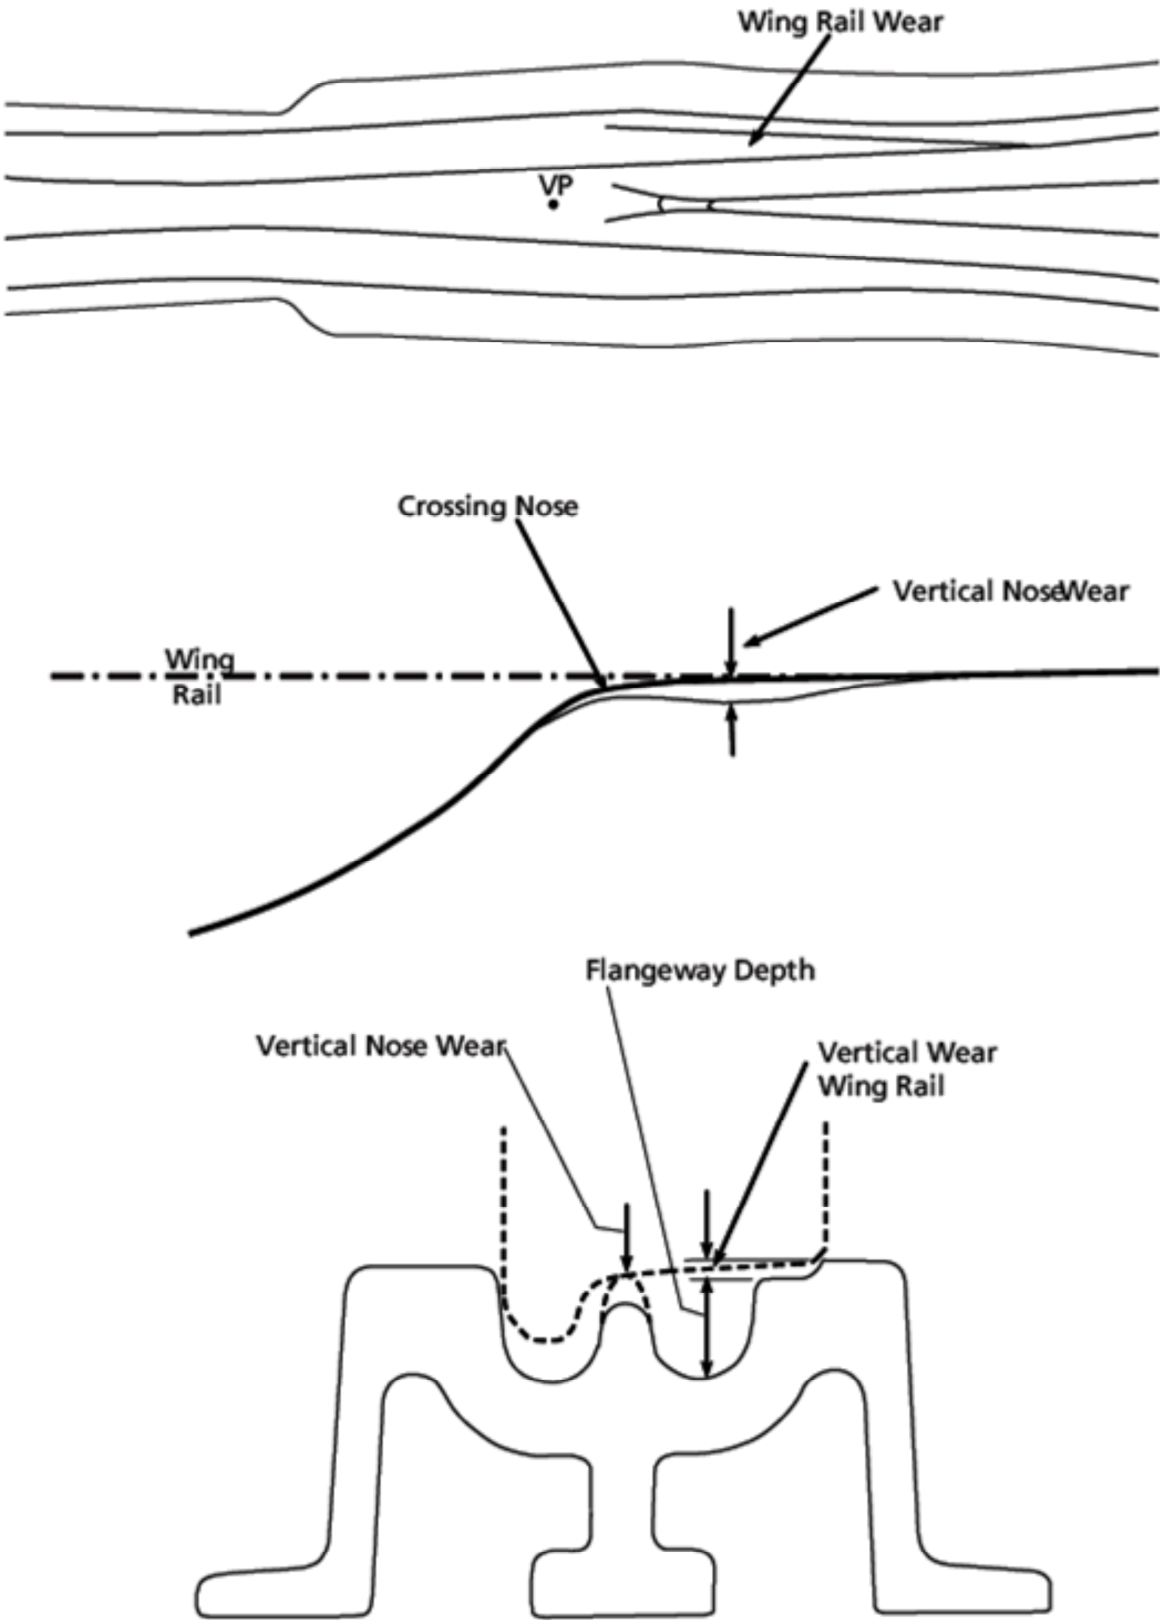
FLANGEWAY DEPTH AND CLEARANCE DEFINITIONS
